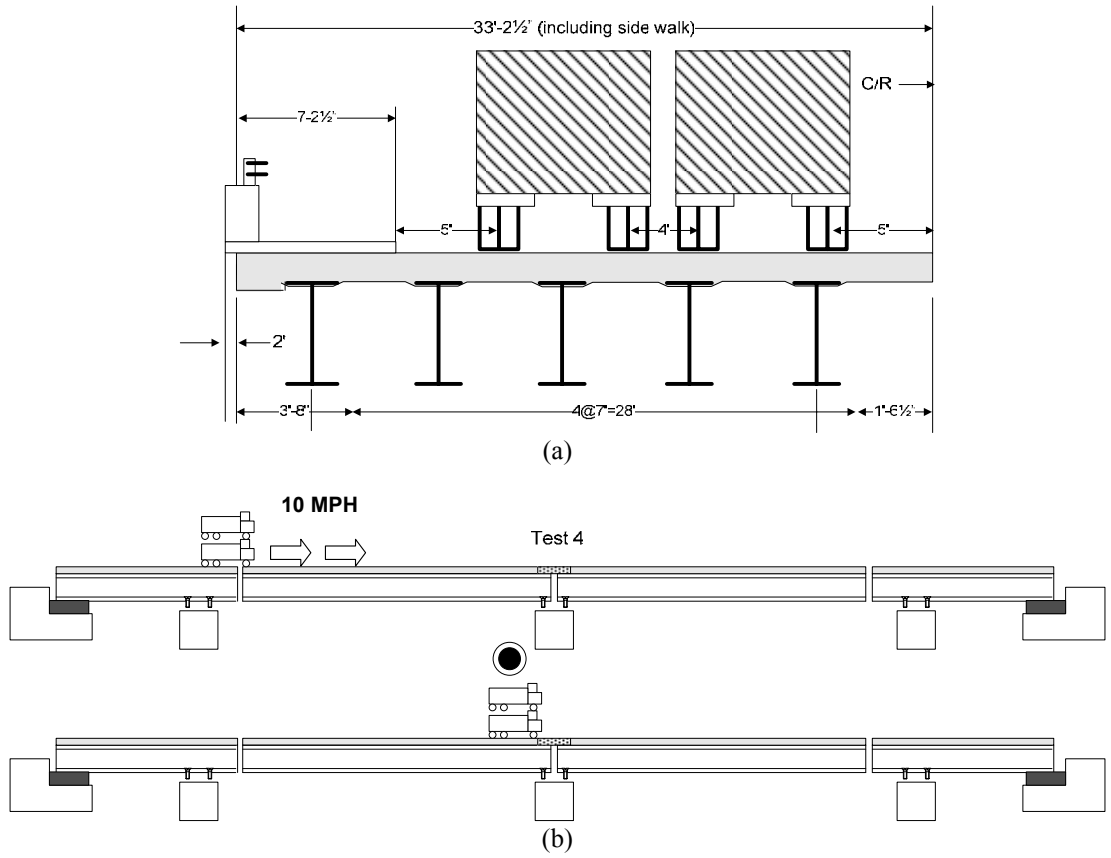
(a) Transverse truck location of Test #4; (b) Load plan for Test #4
